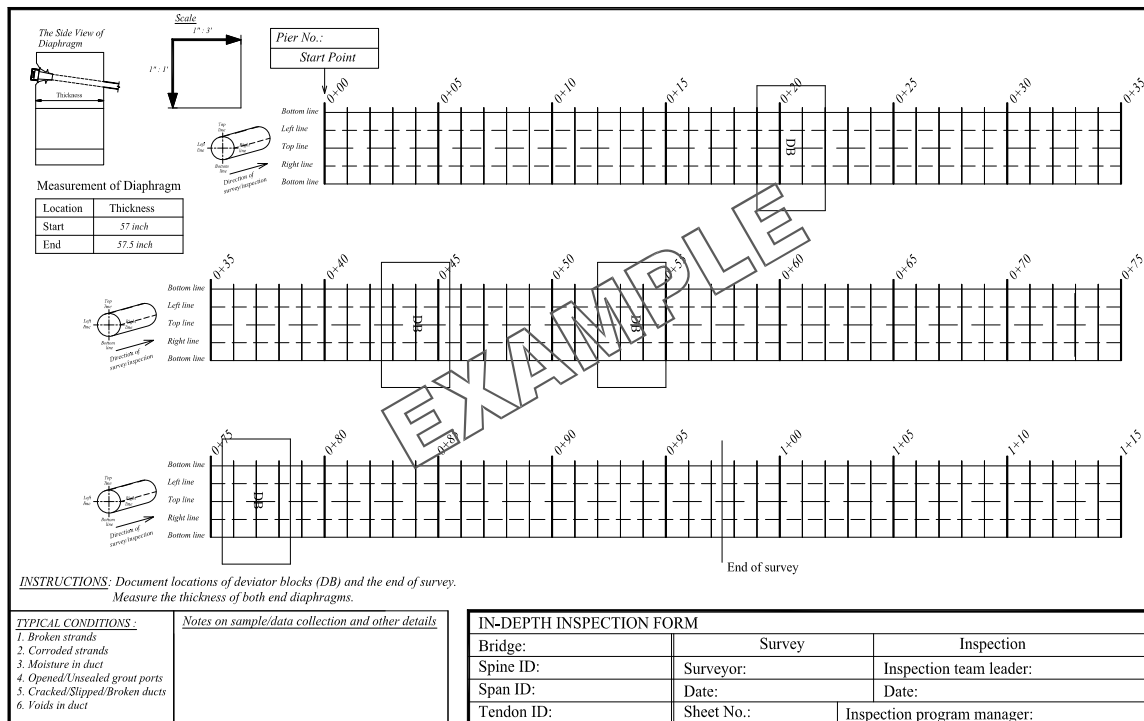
In-Depth Inspection Sheet after Marking Location of Deviator Block.
